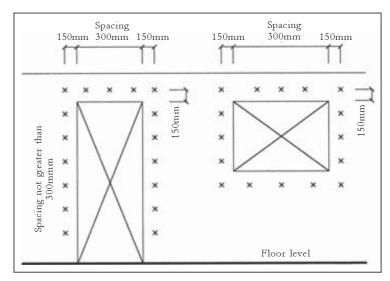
Positioning of wall ties around openings in cavity and collar jointed walls
